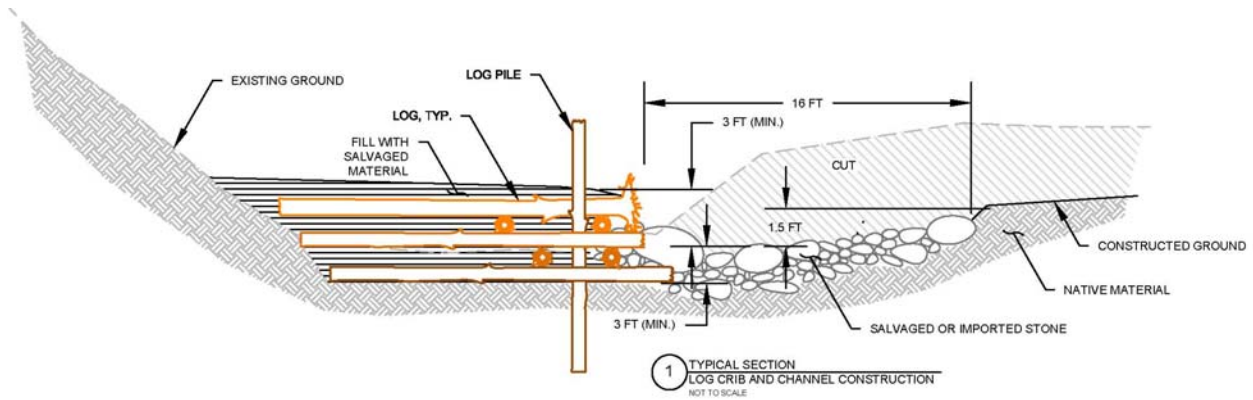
Typical cross section detailing the dimensions and materials used for construction of the log cribs, benches and channel.
